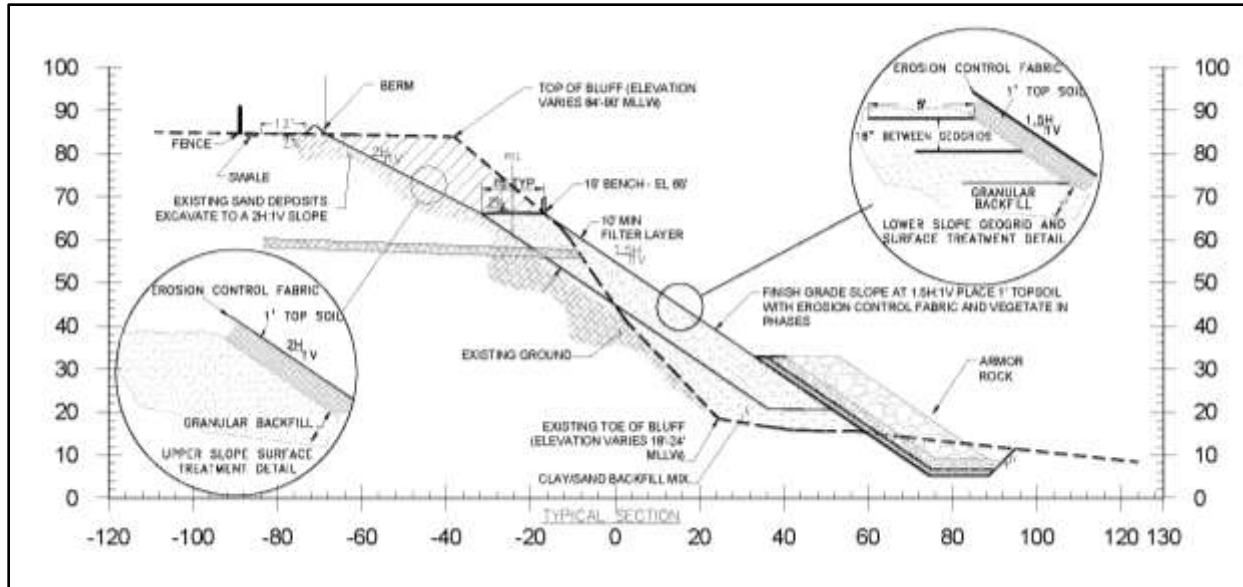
Alternative 3 Typical Section – Revetment with Buried Toe
